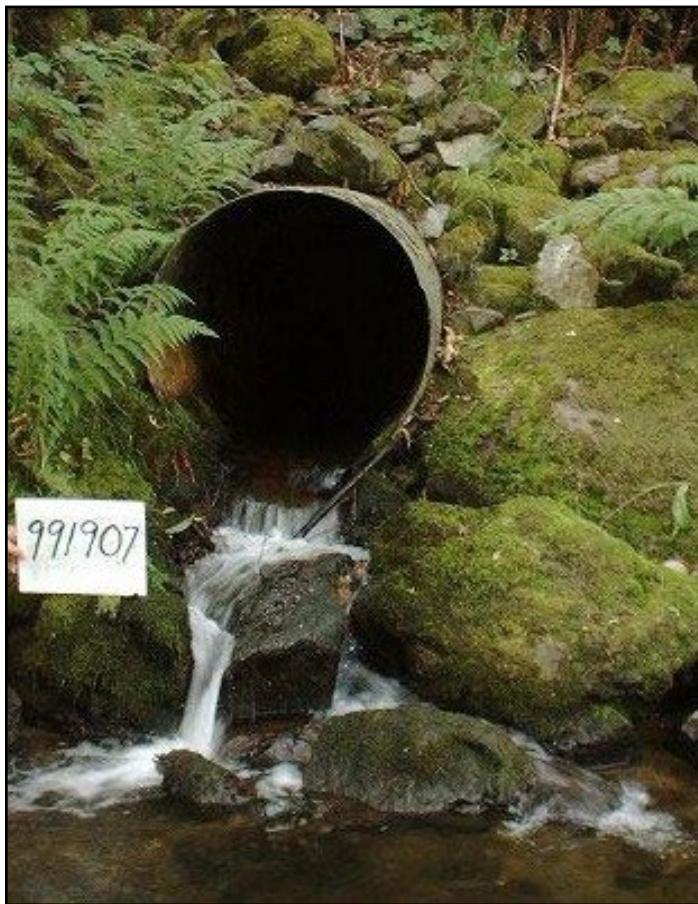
The old crossing was a 3 ft diameter culvert that was a barrier due to a hydraulic drop at the outlet.
